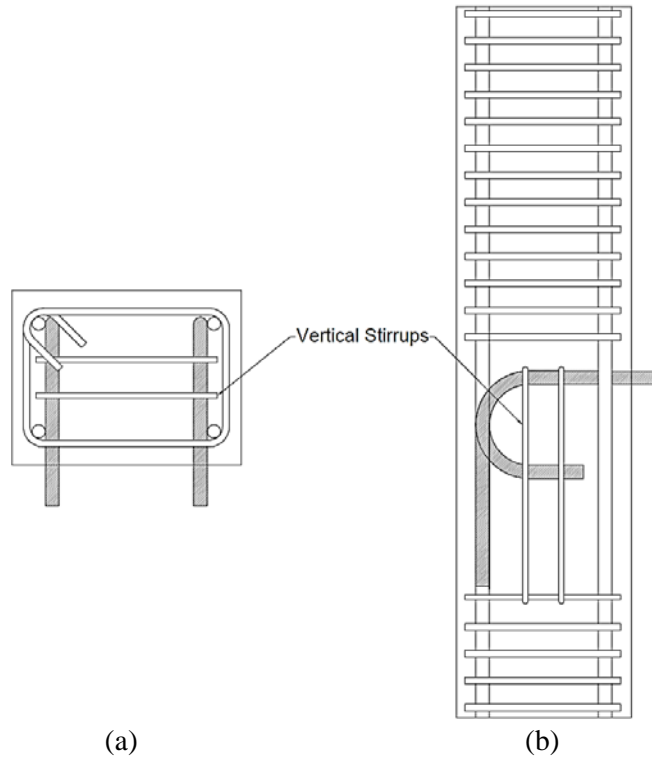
Details of specimen with vertical ties (a) cross-section and (b) side view
